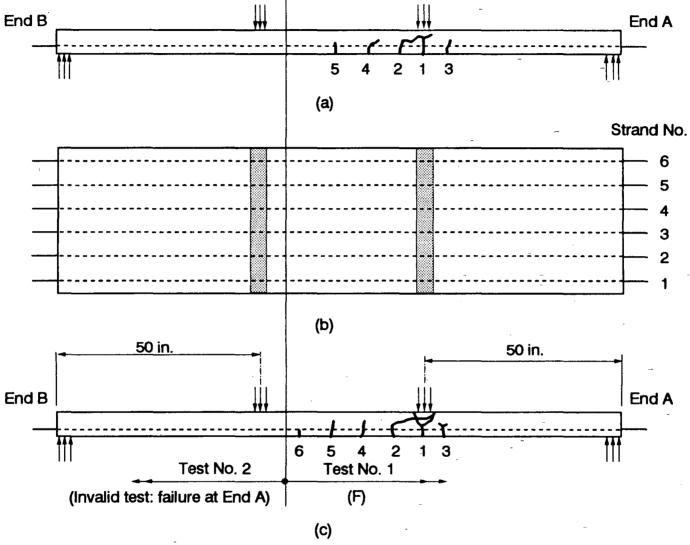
Crack pattern for D-type Specimen No. 6-6.0DU-1:
